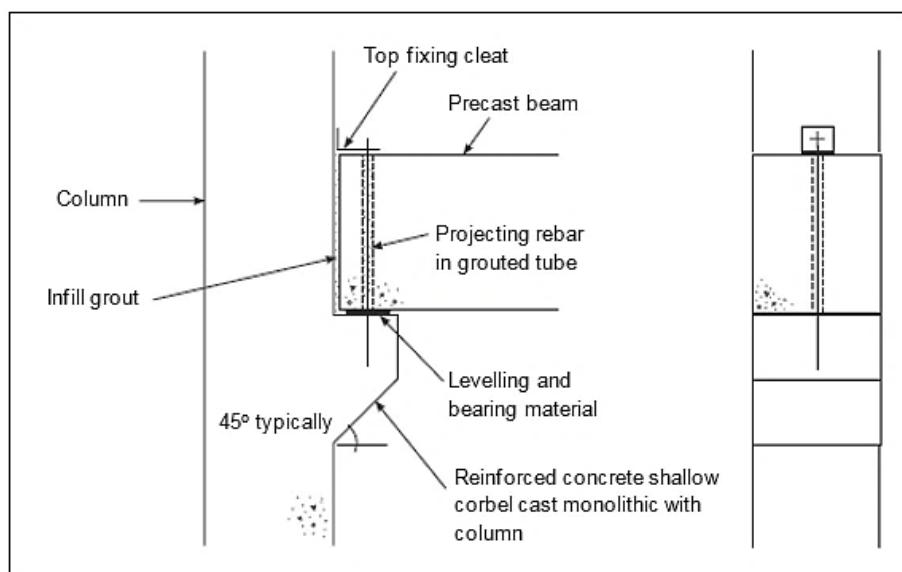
Beam to column connection using a grouted sleeve connection (Elliott, 2002)
